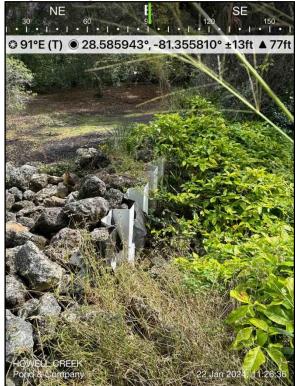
Structure 14; Wooden/Concrete Bag Retaining Wall at S Penn. Ave. (Priority 4)
